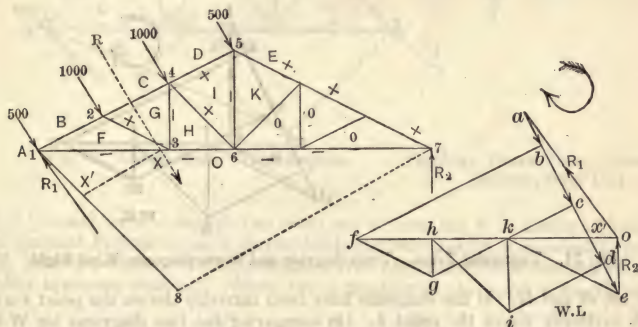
Triangular Truss. Truss-diagram and Stress-diagram, Wind Left
